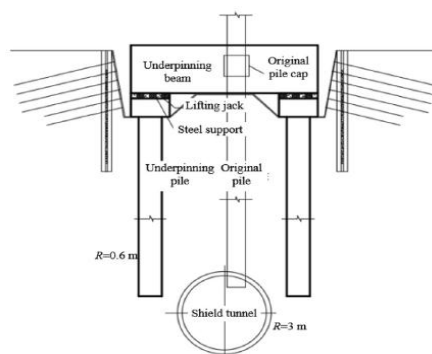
Pile foundation underpinning scheme of Shenzhen Metro Line 10 passing through the bridge pile foundation group of Guangzhou-Shenzhen highway
